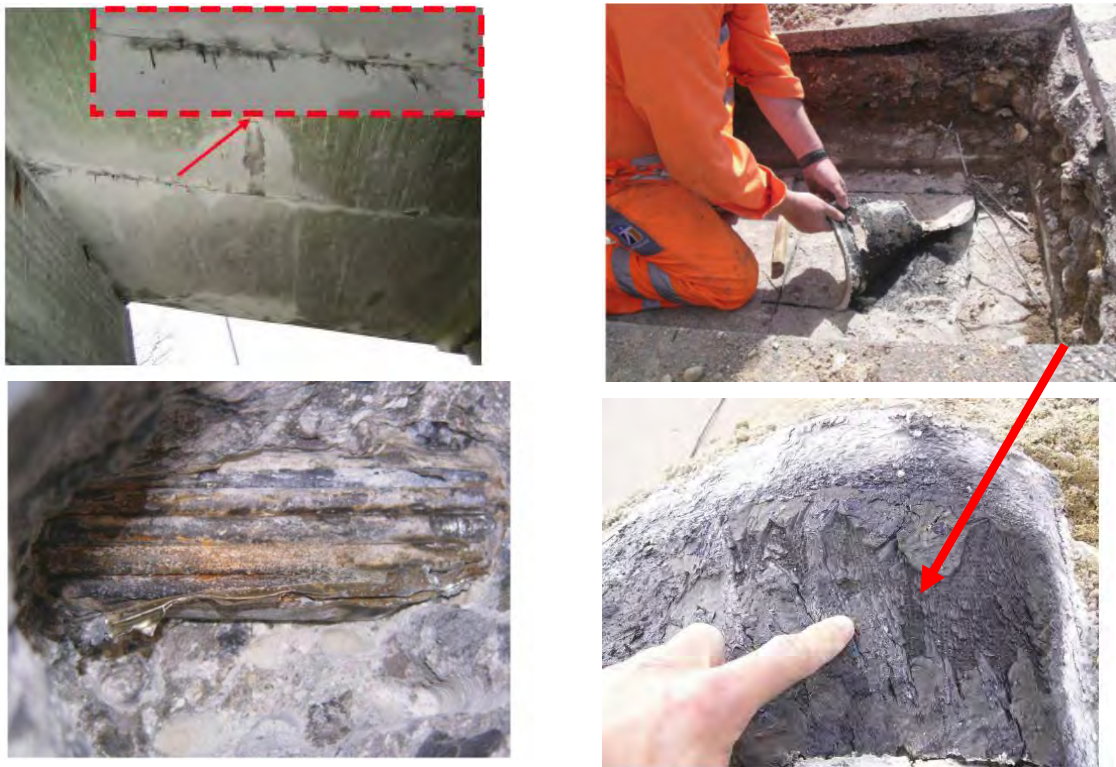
Defective water proofing and corroded post-tensioned reinforcement
